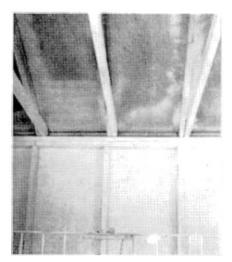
Interior of portable Grade A dairy barn with plywood-covered walls and roof. Studs and rafters are 2 feet on centers. One x 4-inch stiffeners between the rafters would be desirable.
